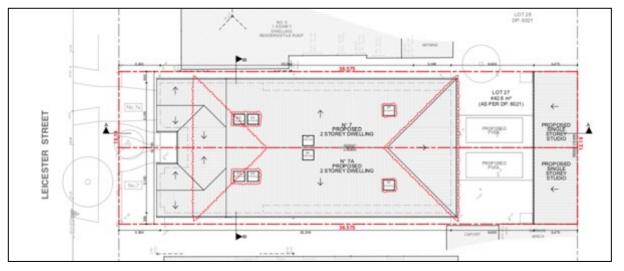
Proposed subdivision plan Figure 2: Proposed Site Plan
